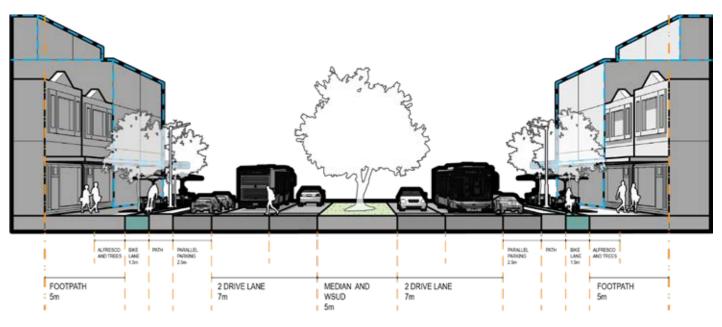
Indicative cross-section High Street (between Sladen Street and Cranbourne Railway Station) - subject to further investigation and detailed design
